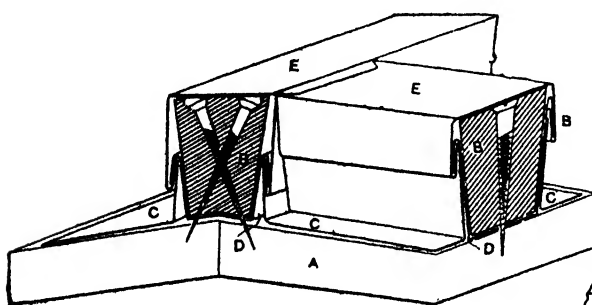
Showing Ridge Strip and Common Strip Fig. 171. Showing General Construction of Zinc Roof
